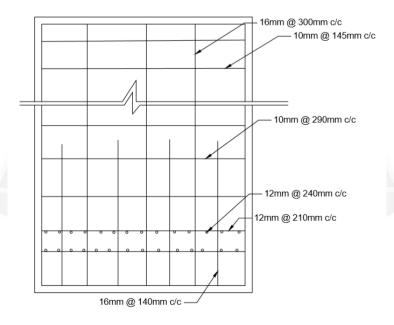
Cantilever retaining wall (Reinforcement details Longitudinal cross section)
